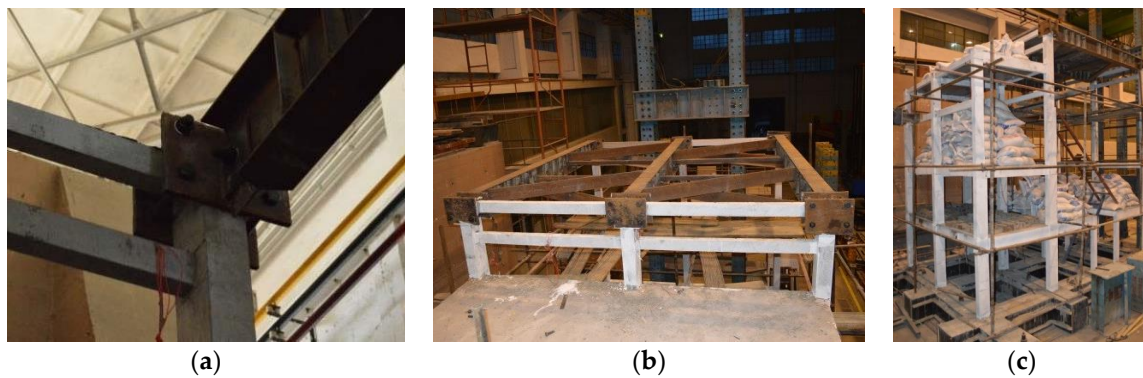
Making substructure model. (a) Connection between steel beam and connector. (b) Steel roof truss installation completed. (c) Integral counterweight.
